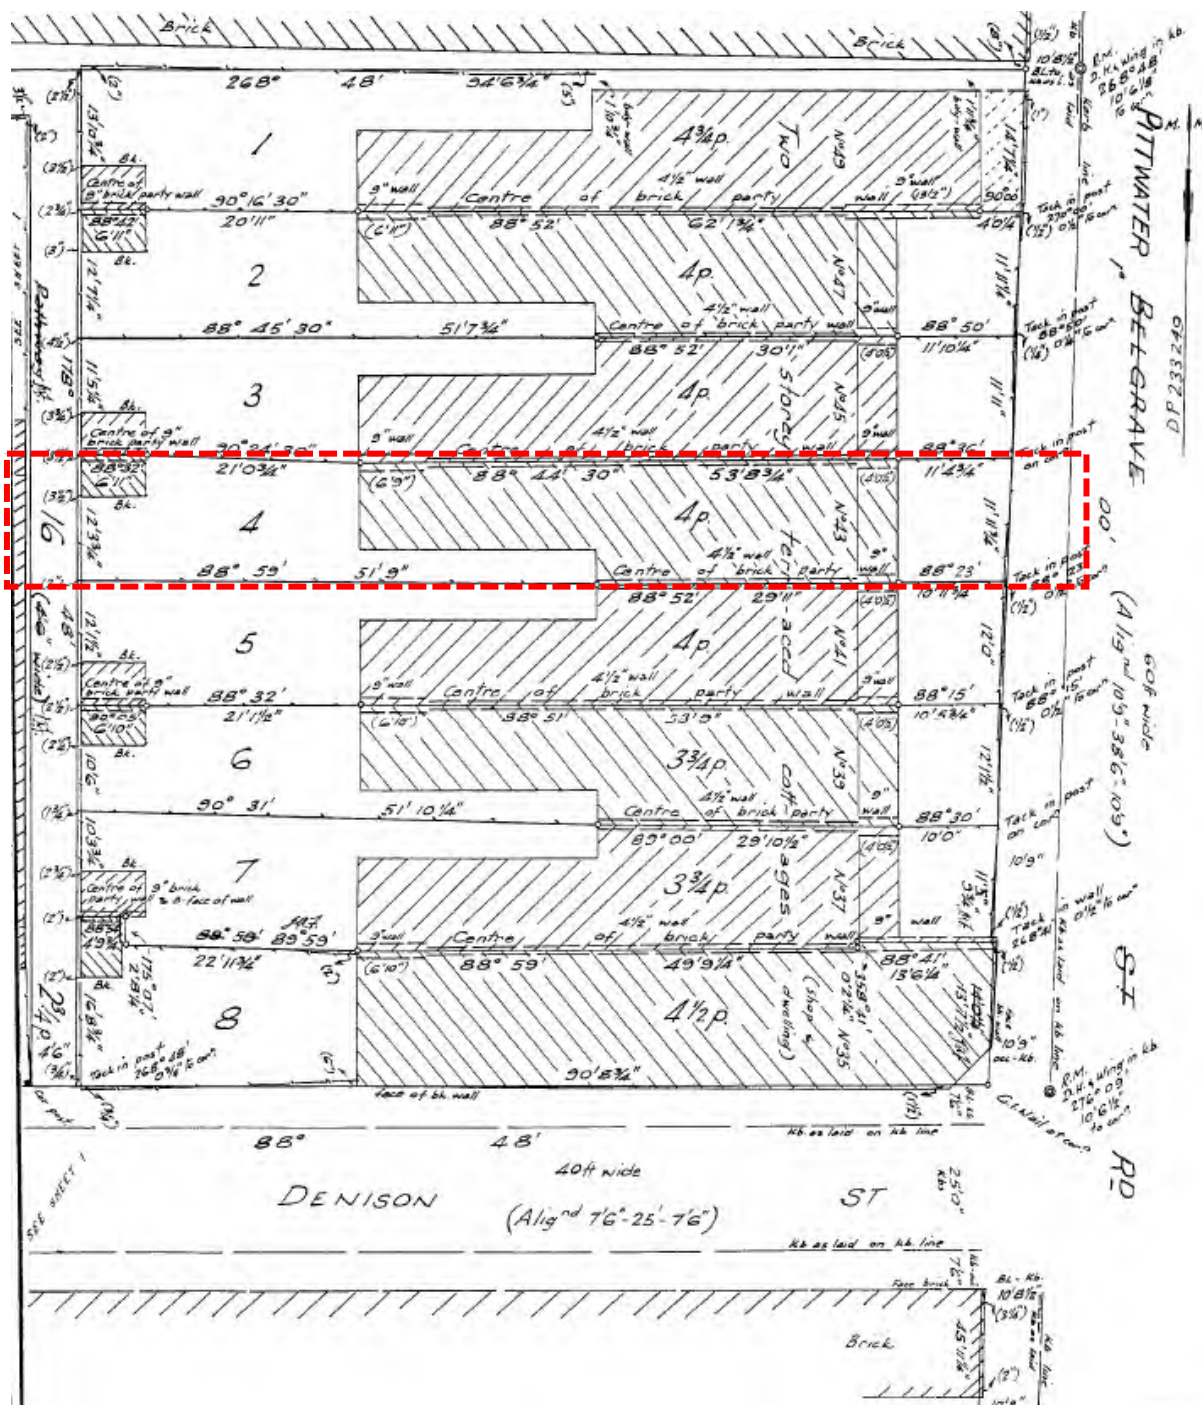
Subdivision Plan of Pittwater Road Row House group at the time of subdivision in 1967. No 43 outlined.
